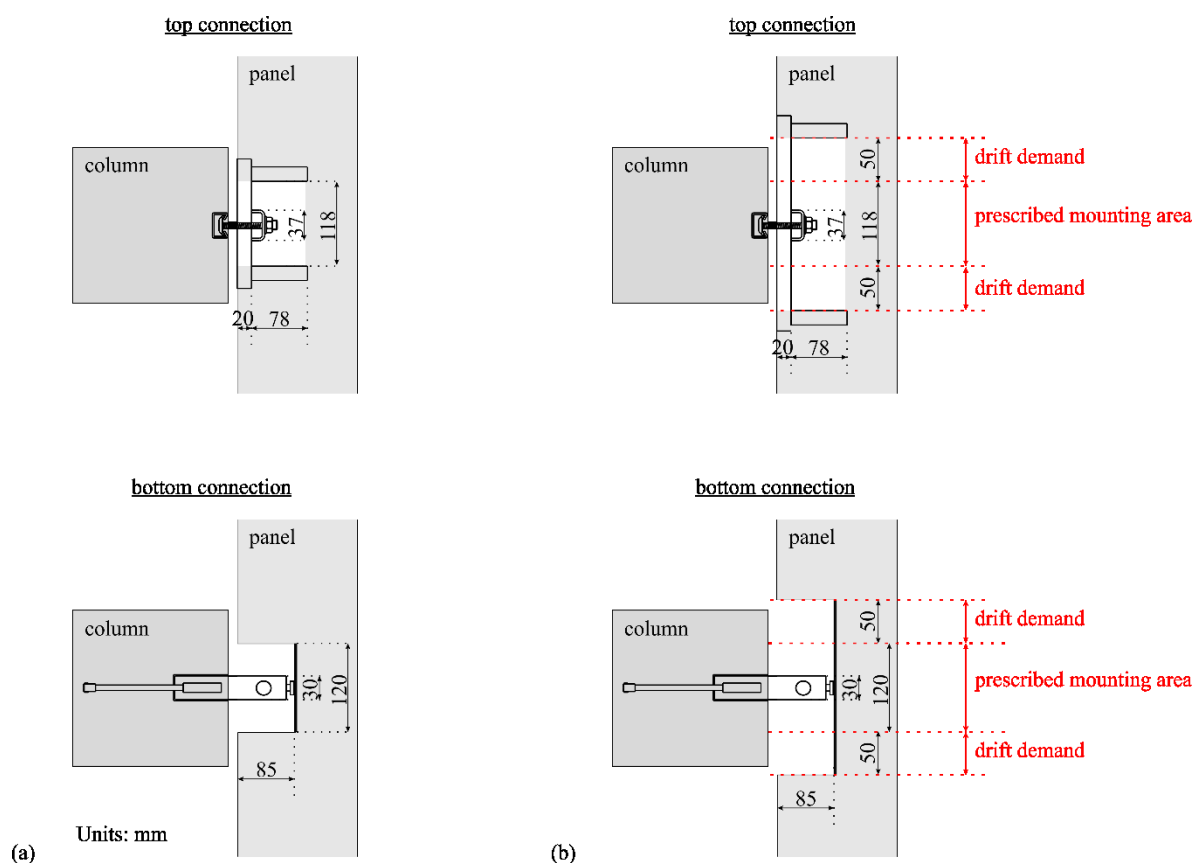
Cladding connections for horizontal concrete panels: (a) existing and (b) improved
